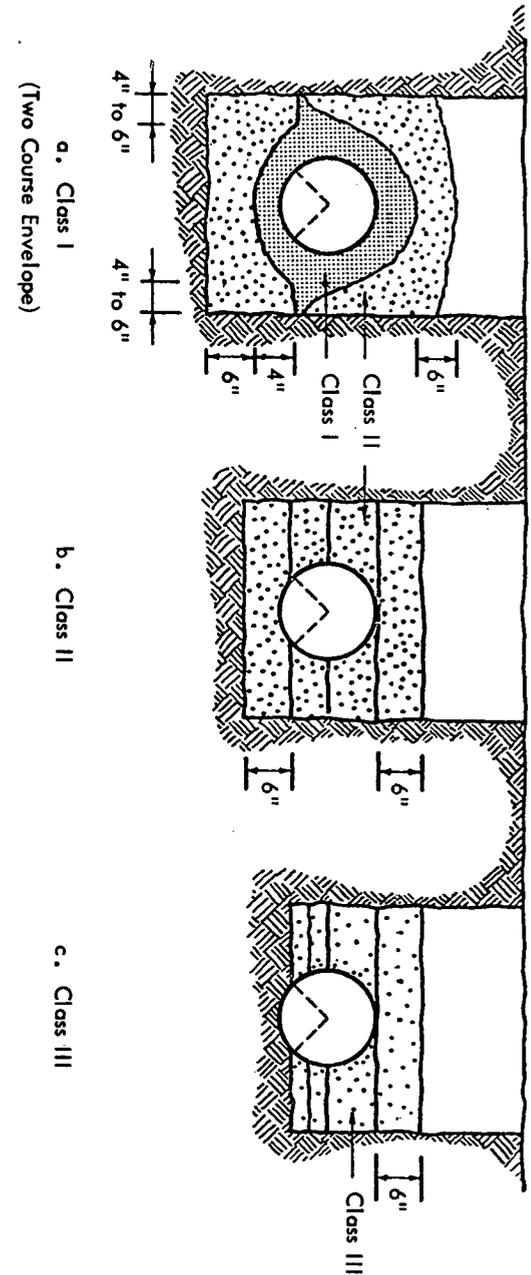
DETAILS OF NH-1 TRENCH INSTALLATIONS
